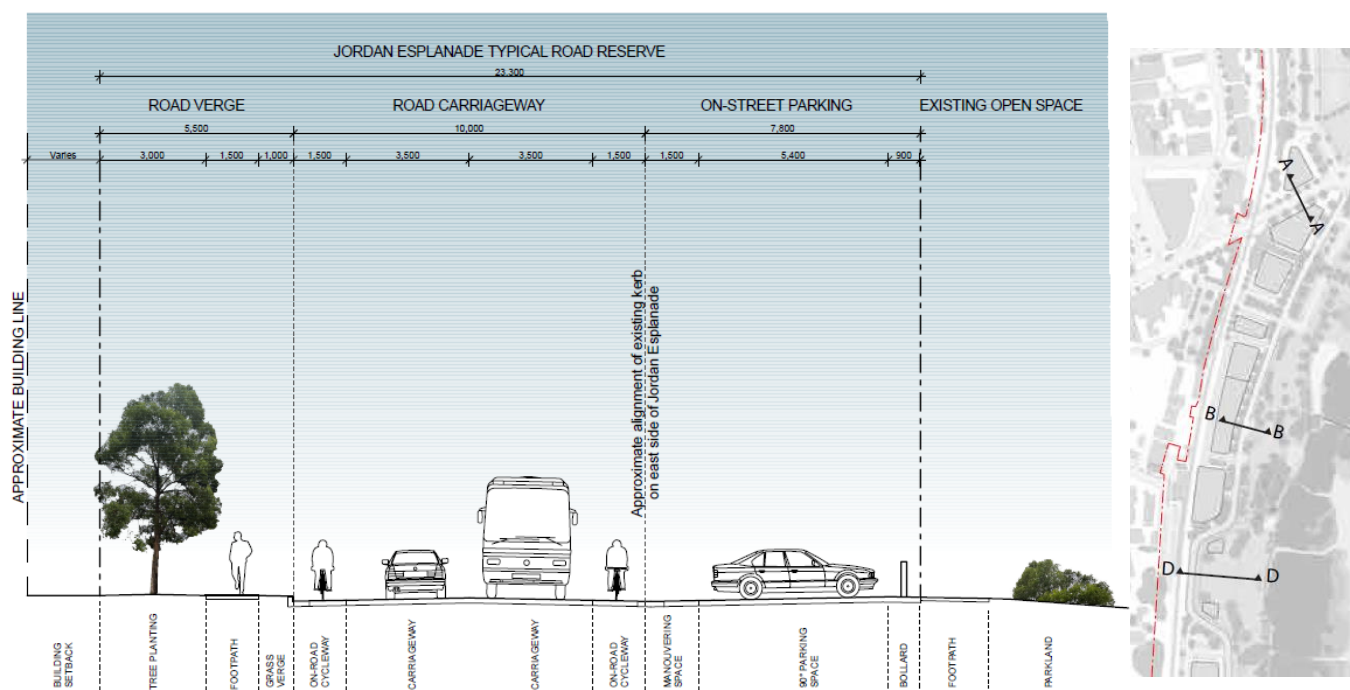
Typical street cross section (Jordan Esplanade) (Section B)
